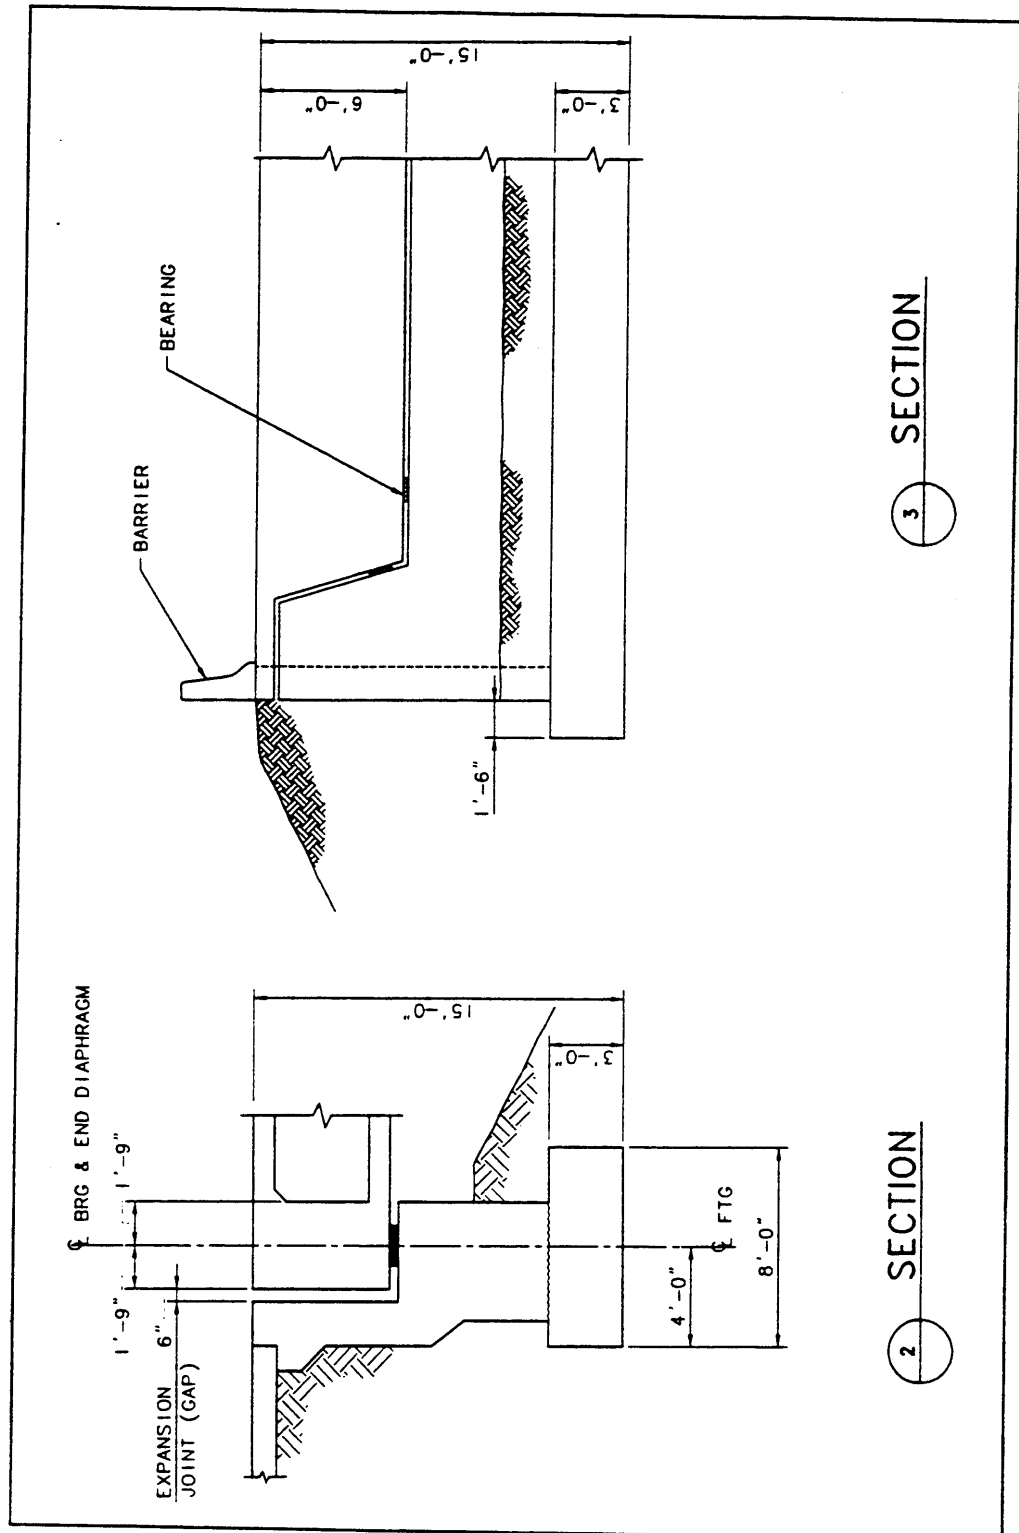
Bridge No. 4 - Seat-Type Abutment
